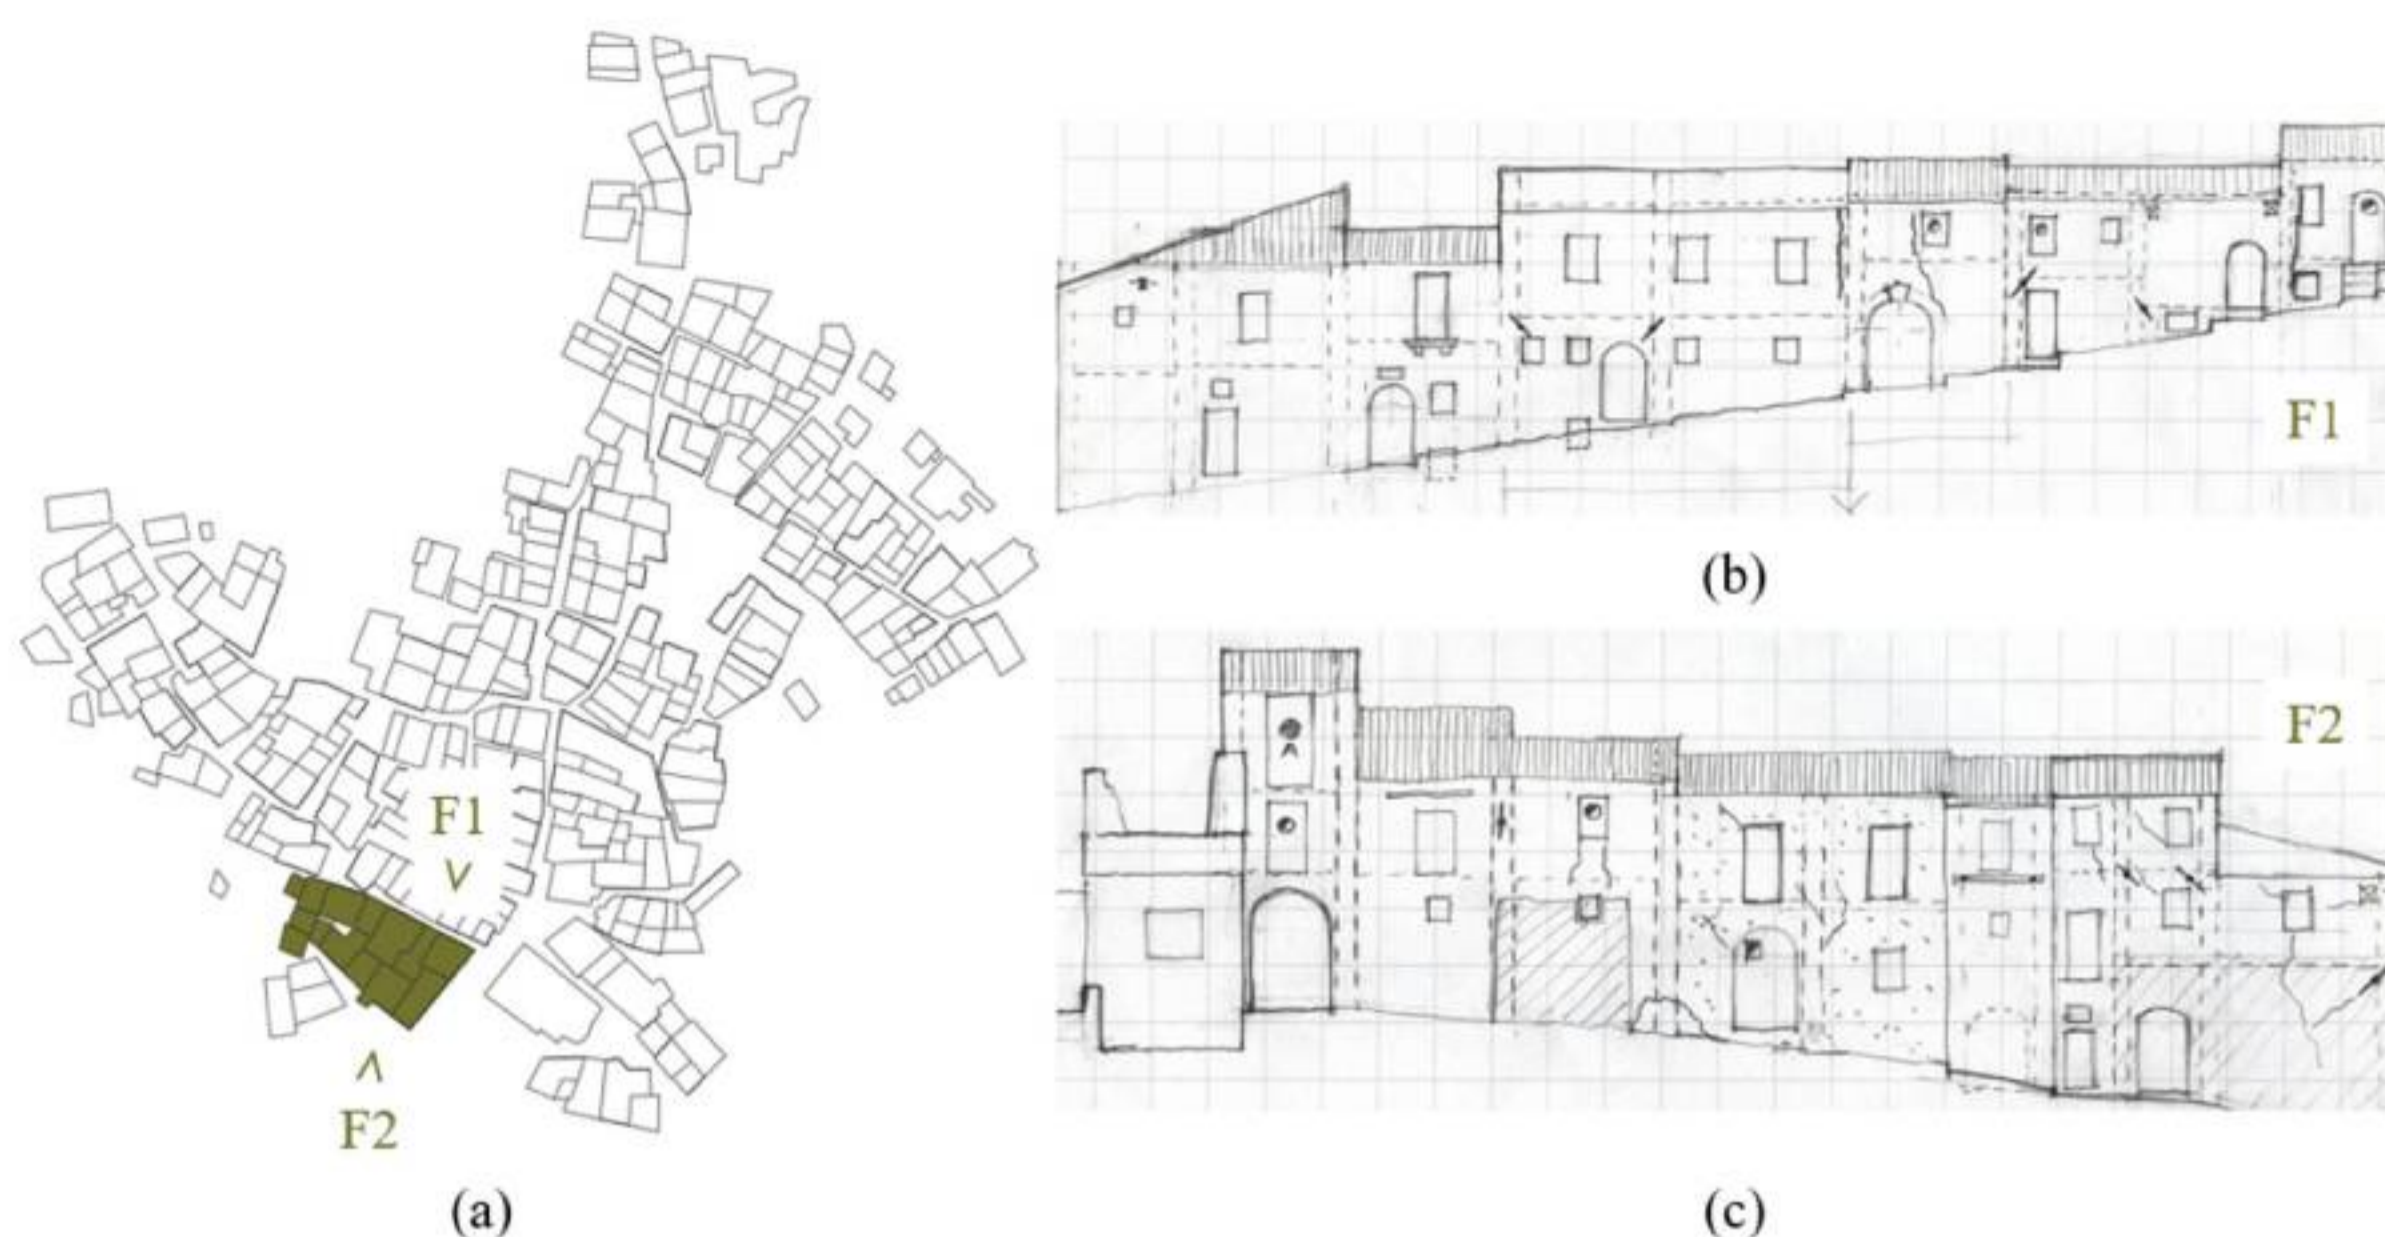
(a) Planimetric layout of the historic center of Casentino. A typical aggregate is highlighted. (b) and (c) Diagram of the elevation of the aggregate highlighted.
